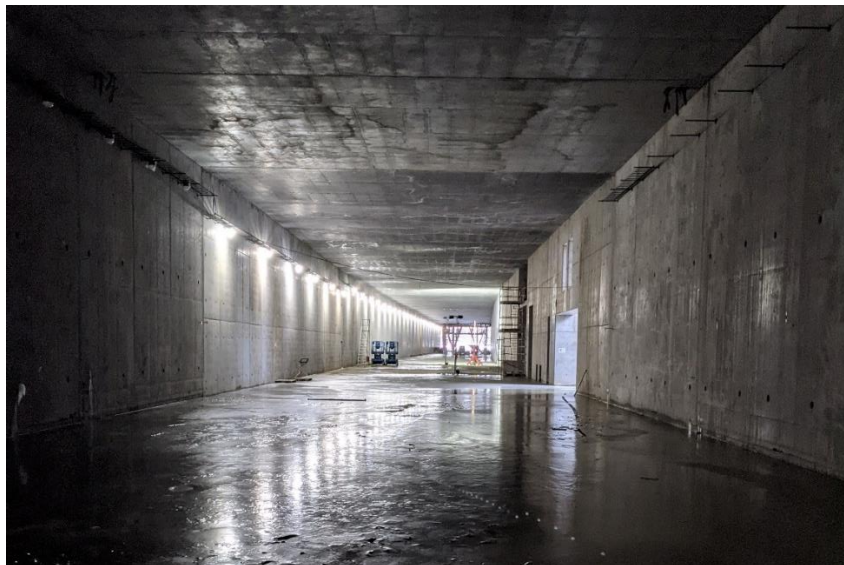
Inside the finished tunnel of the case study's cross section.
